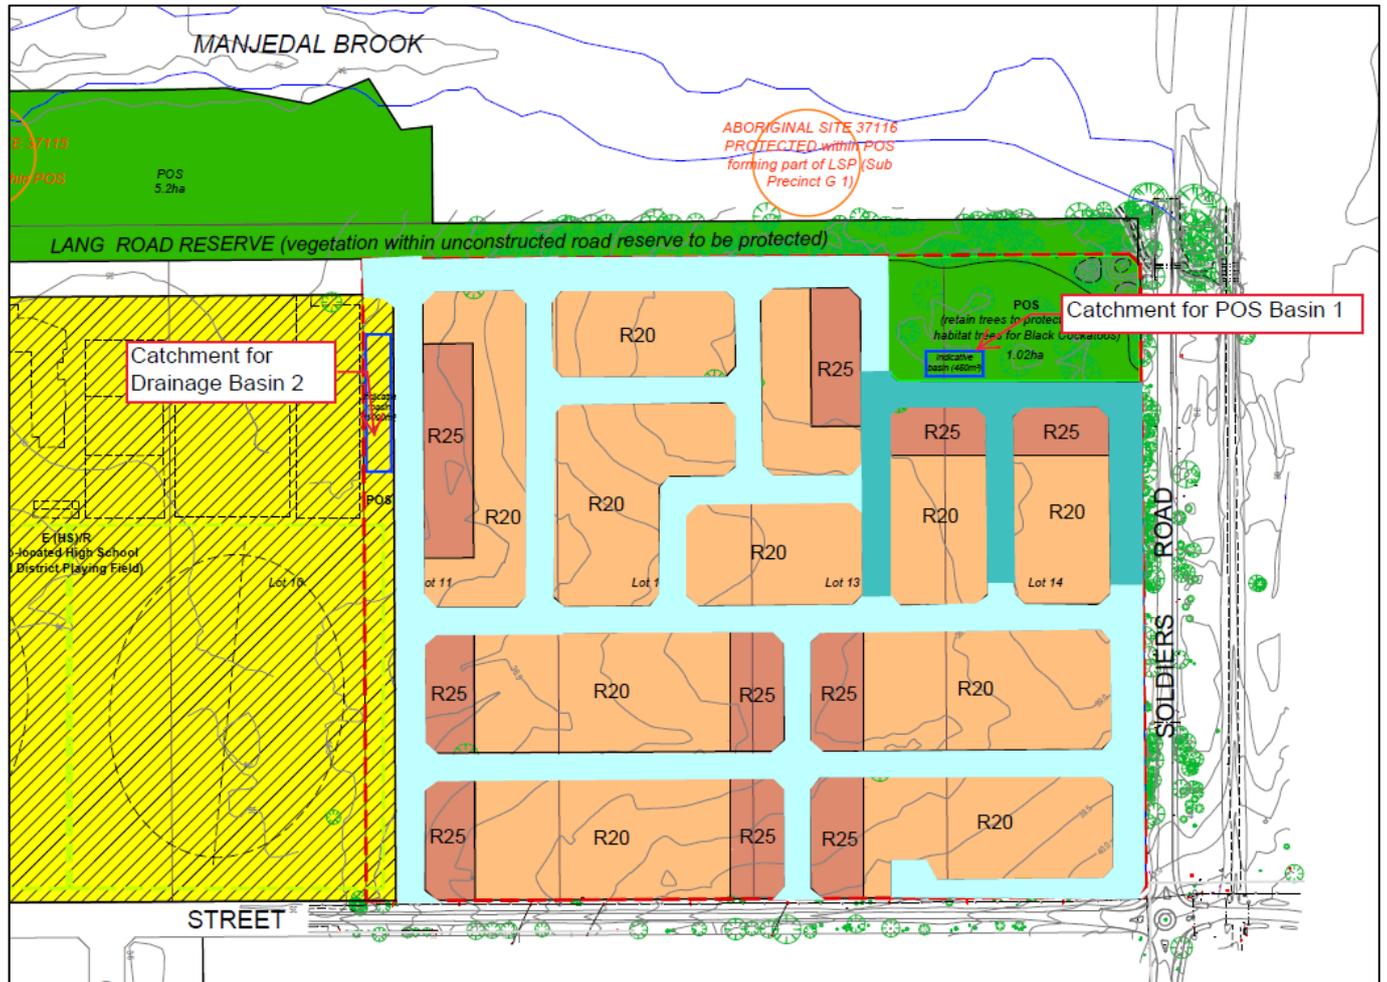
Proposed Catchment Plan and Drainage Basin Locations
